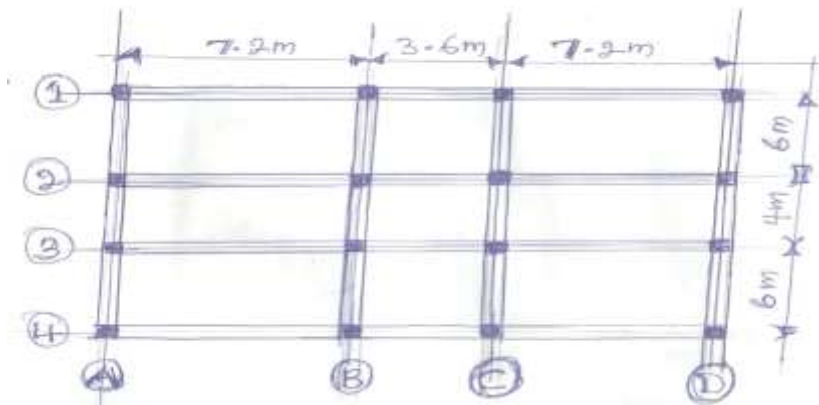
Typical Floor Plan of Slab in a Five Storey Building Office Complex
